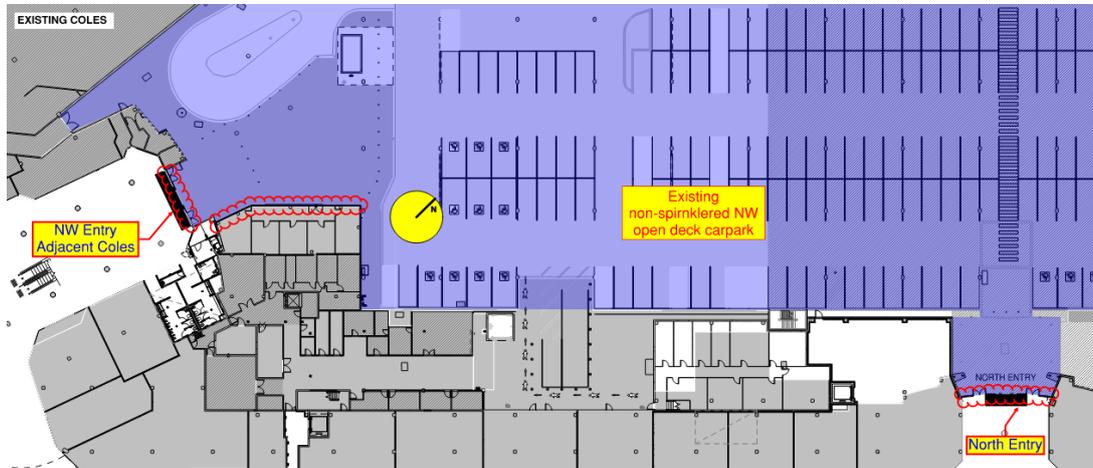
Locations where the walls between the sprinkler protected retail parts of the centre and the open-deck carpark that is not sprinkler protected have glazed sections
